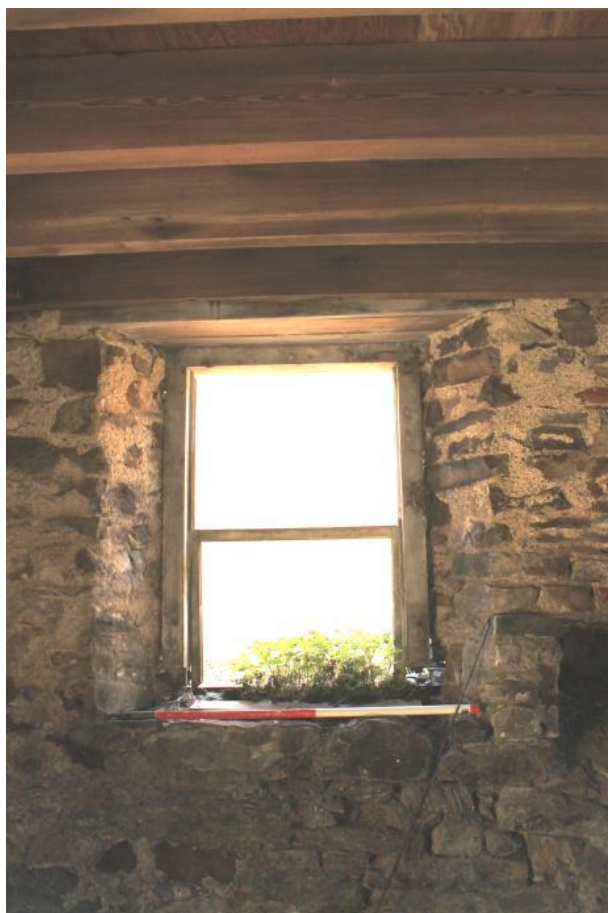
Northwest facing interior ground floor elevation. Window detail.
